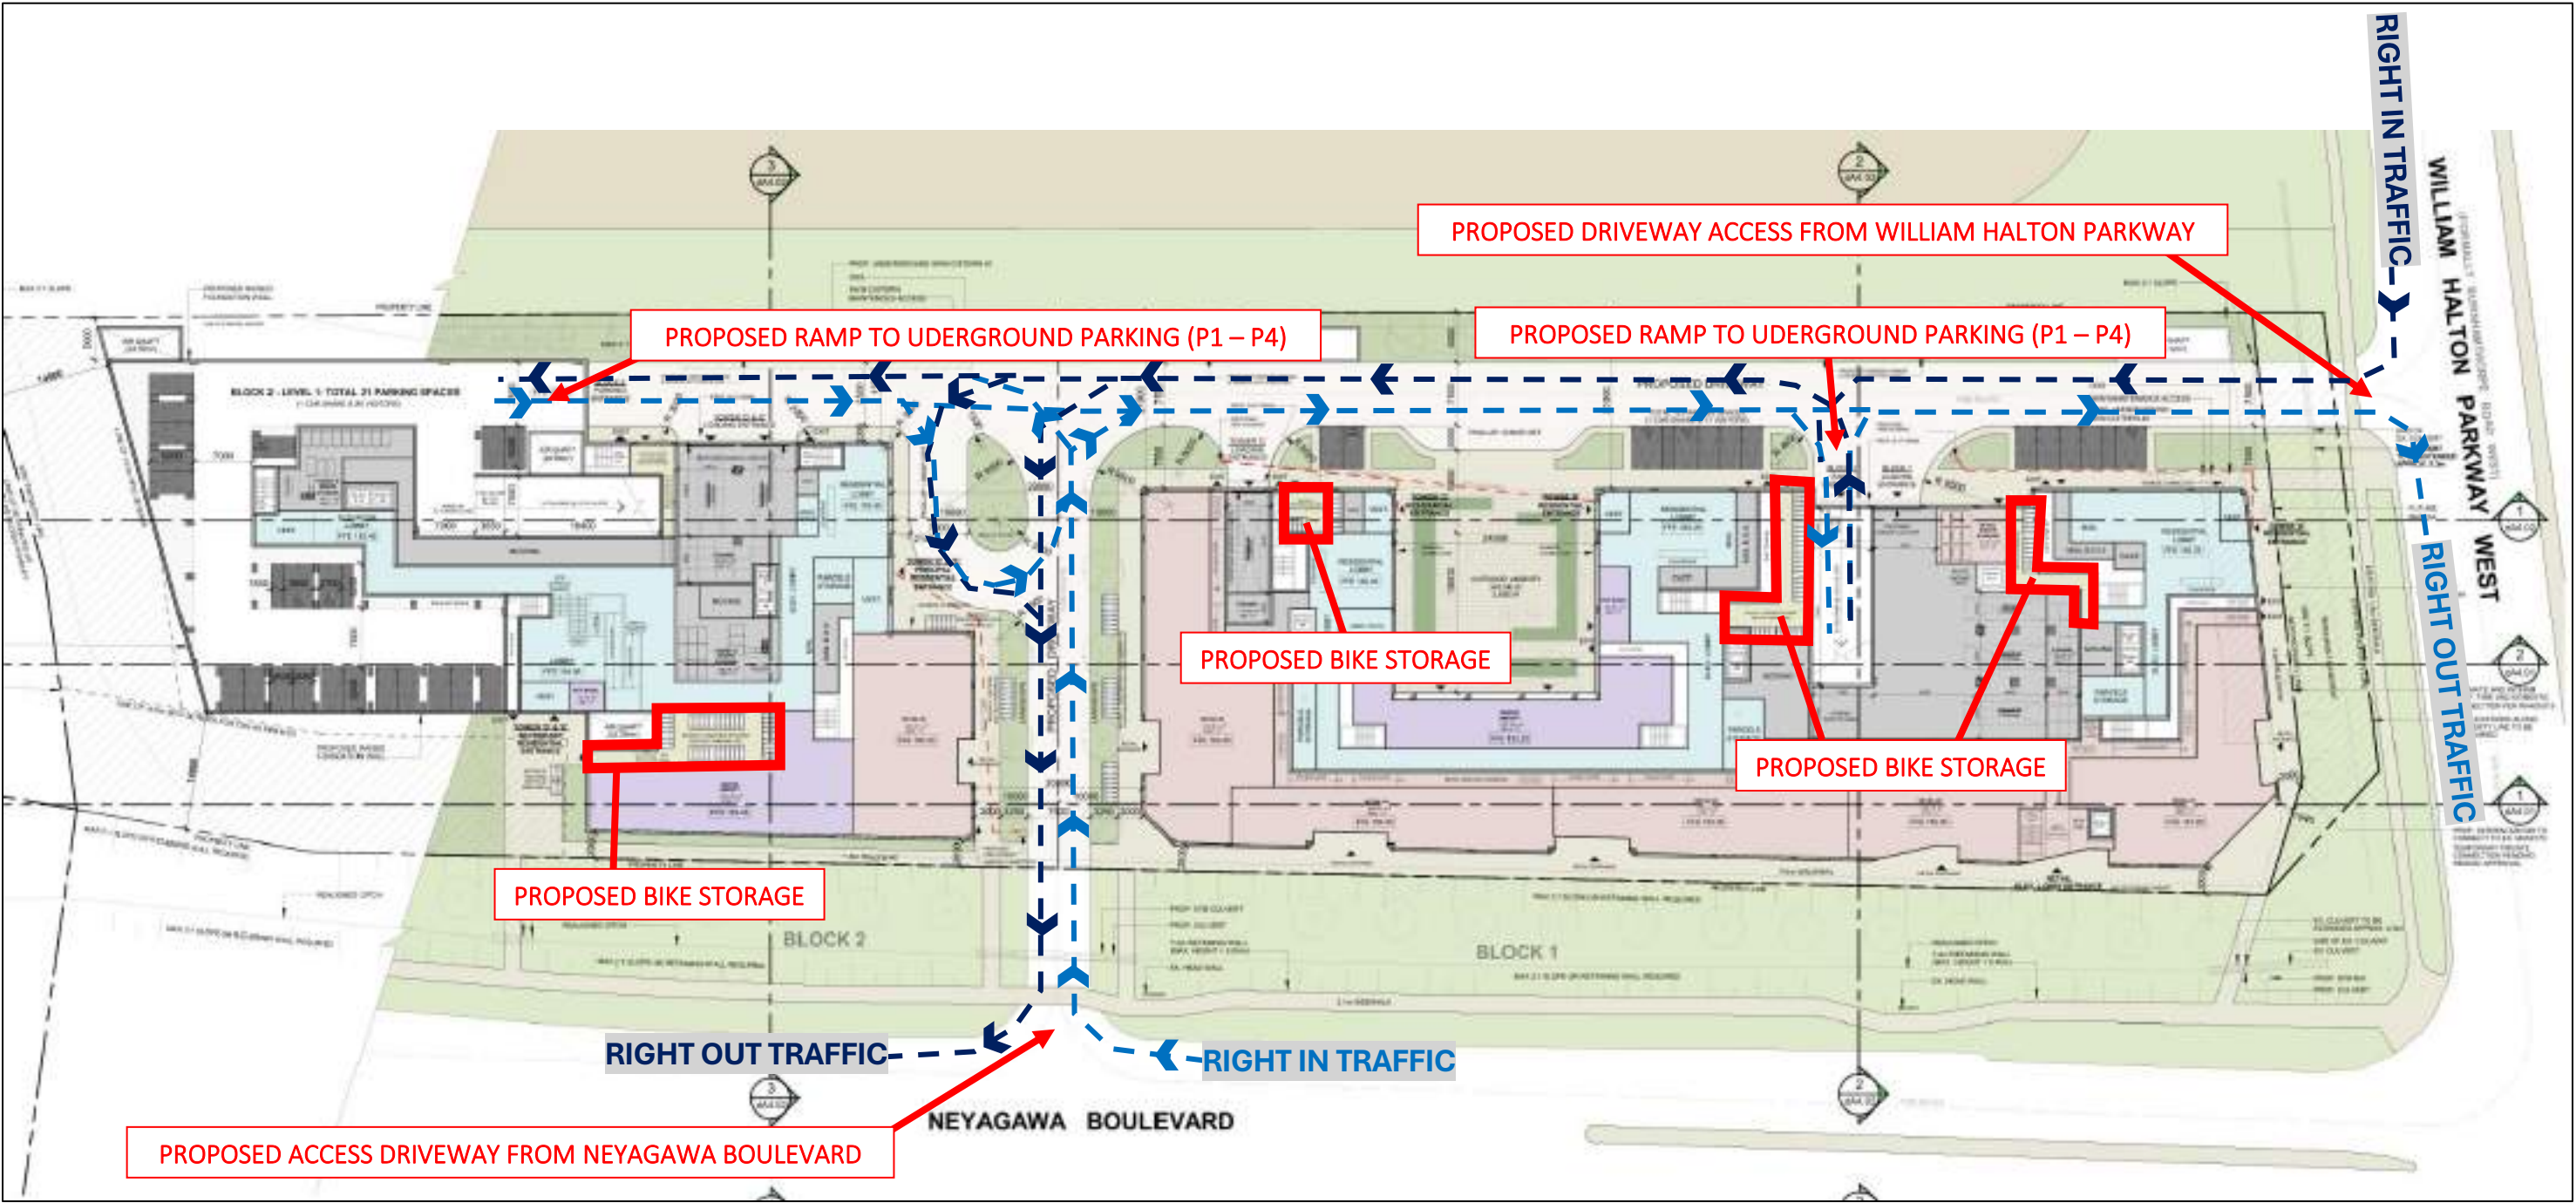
Proposed Parking Access and Vehicle Circulation Plan
